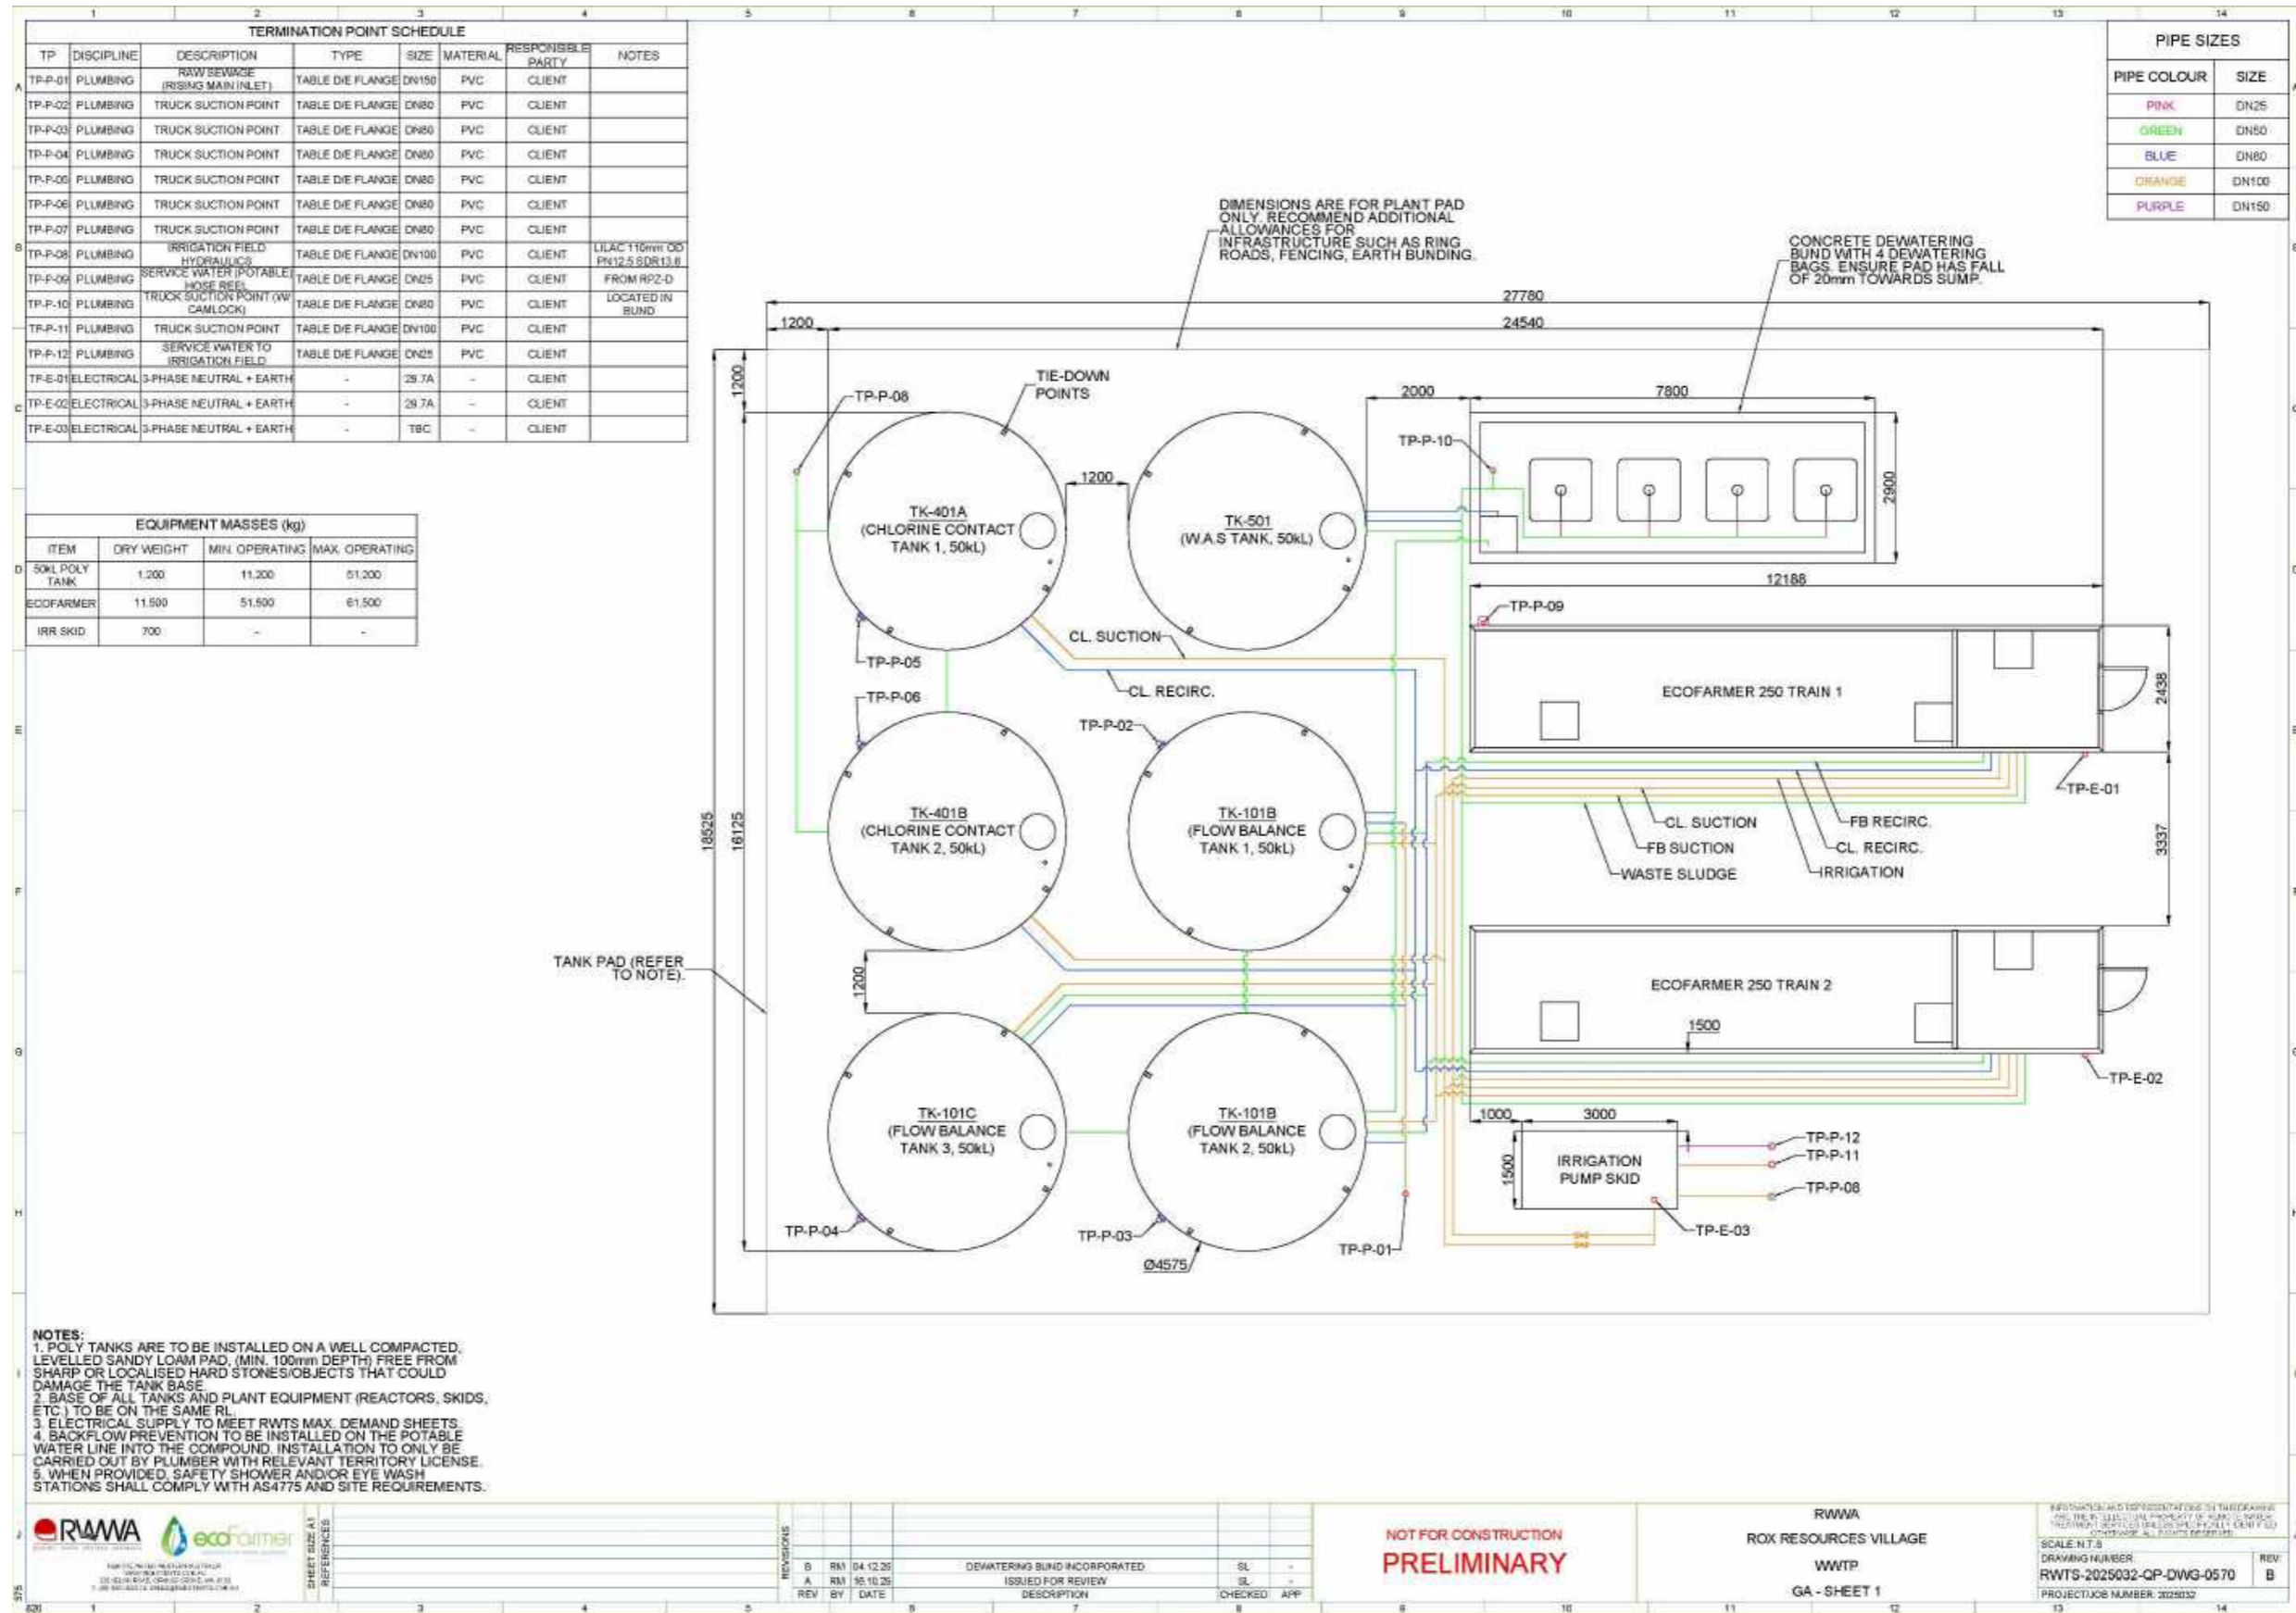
Village Expansion – WWTP and Spray-Field Plan
